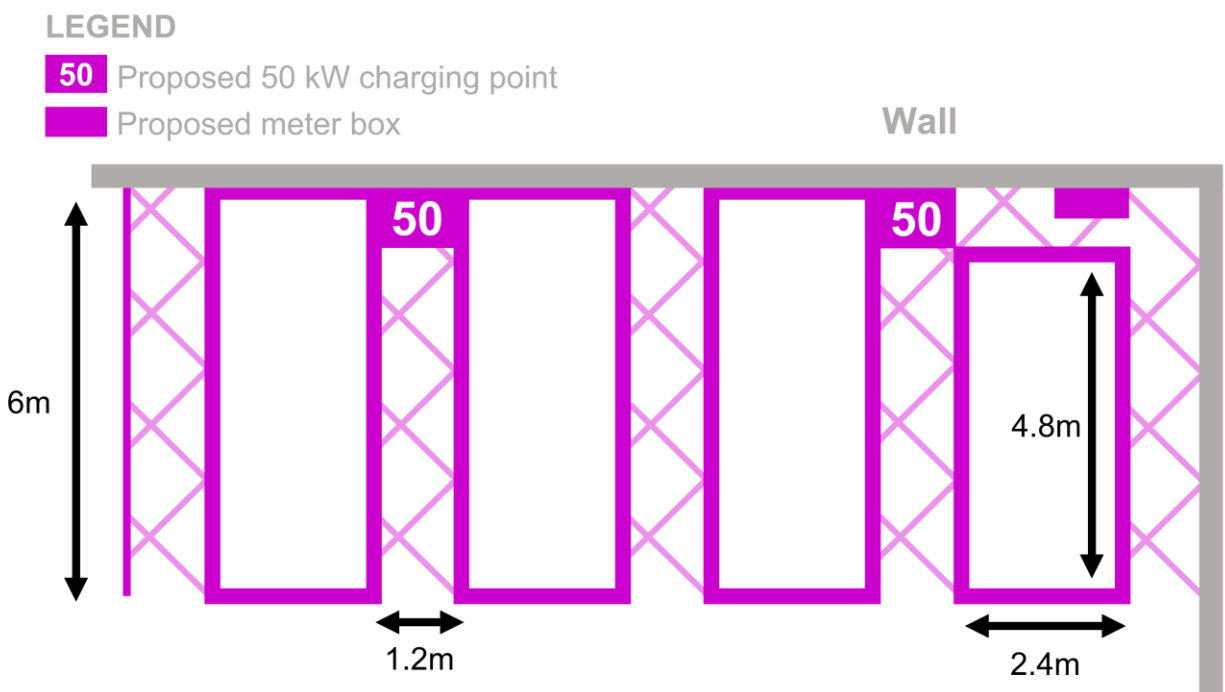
Example site layout for twin 50-kW charging site incorporating long bays for van charging
